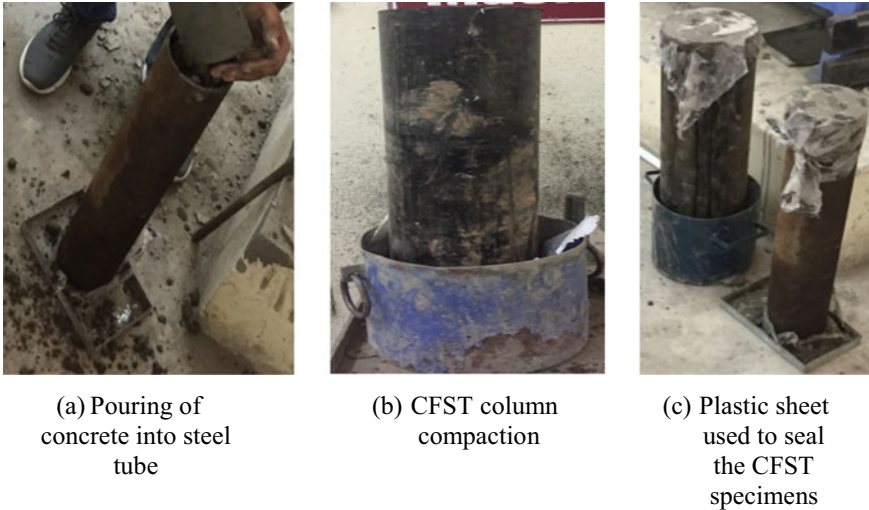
Casting CFST column specimens. a Concrete pouring into steel tube, b CFST column compaction, c plastic sheet used to seal the CFST specimens
